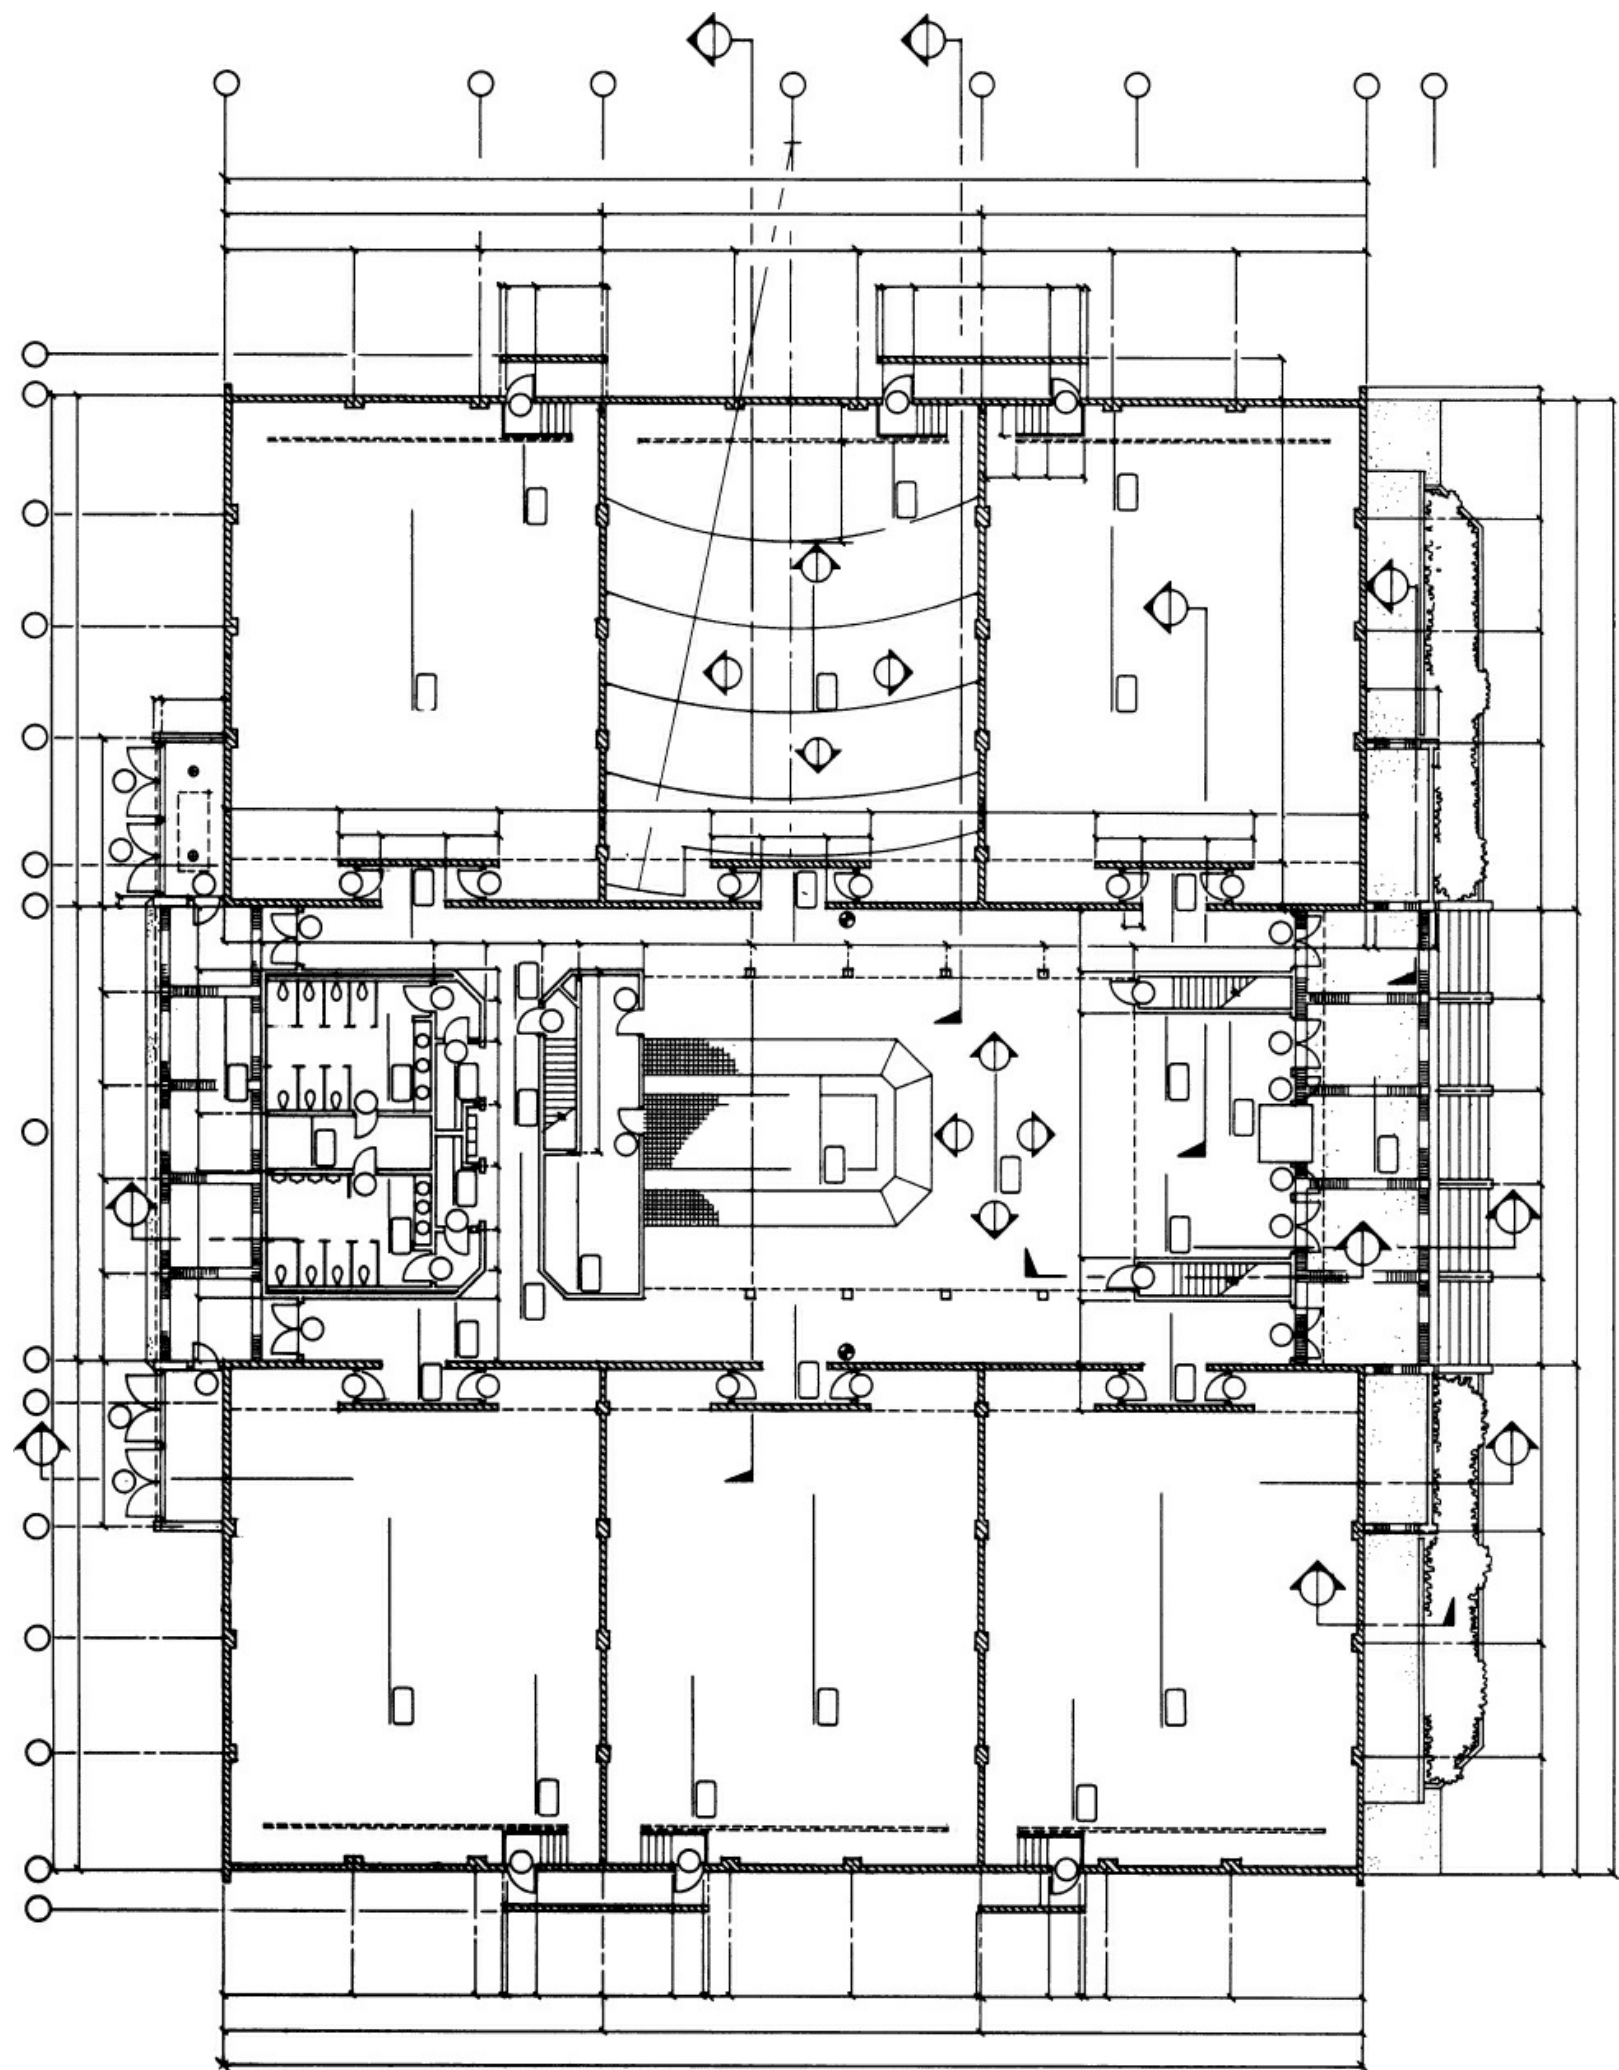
Clay Theater—Stage IV: Working drawing—ground floor plan.
